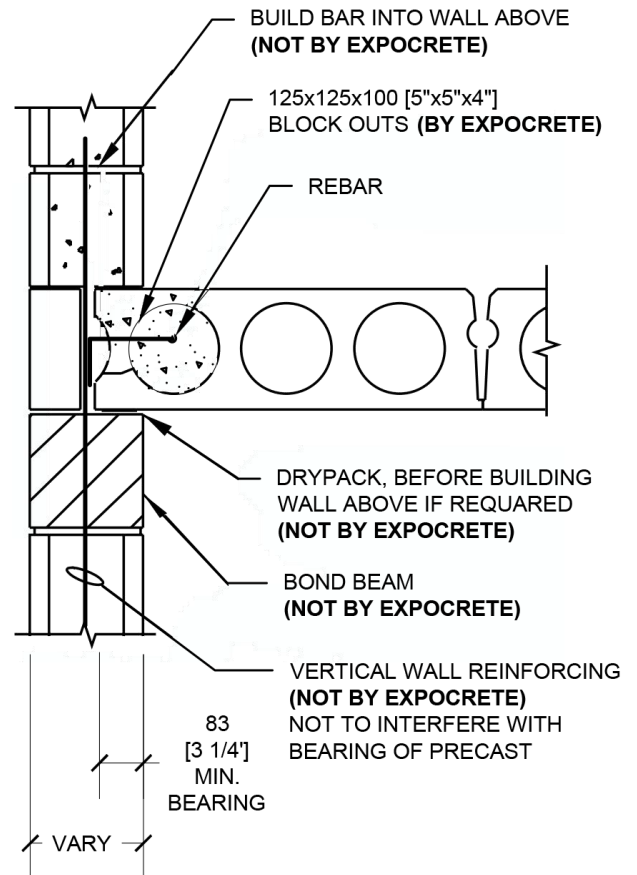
Side Bearing On Block - Half Bearing - Tie Up (Scale - N.T.S.)
